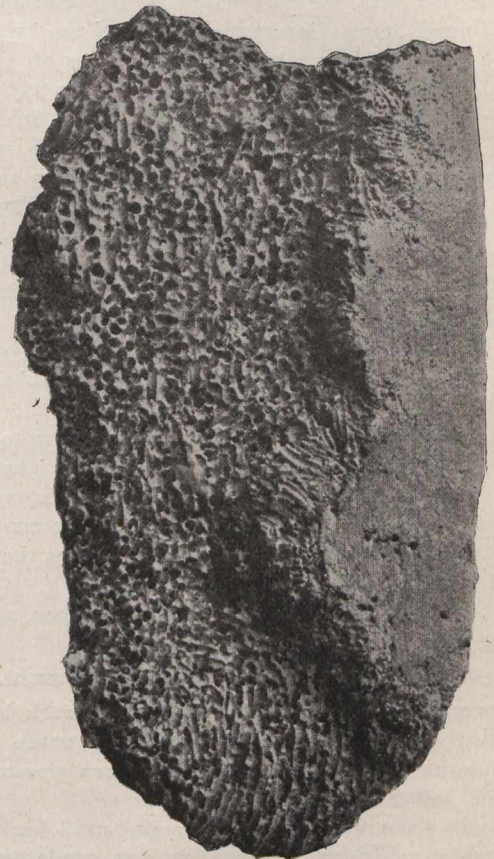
Section of Wooden Pile, Showing the Destructive Work of the Terebo and Limnoria.
